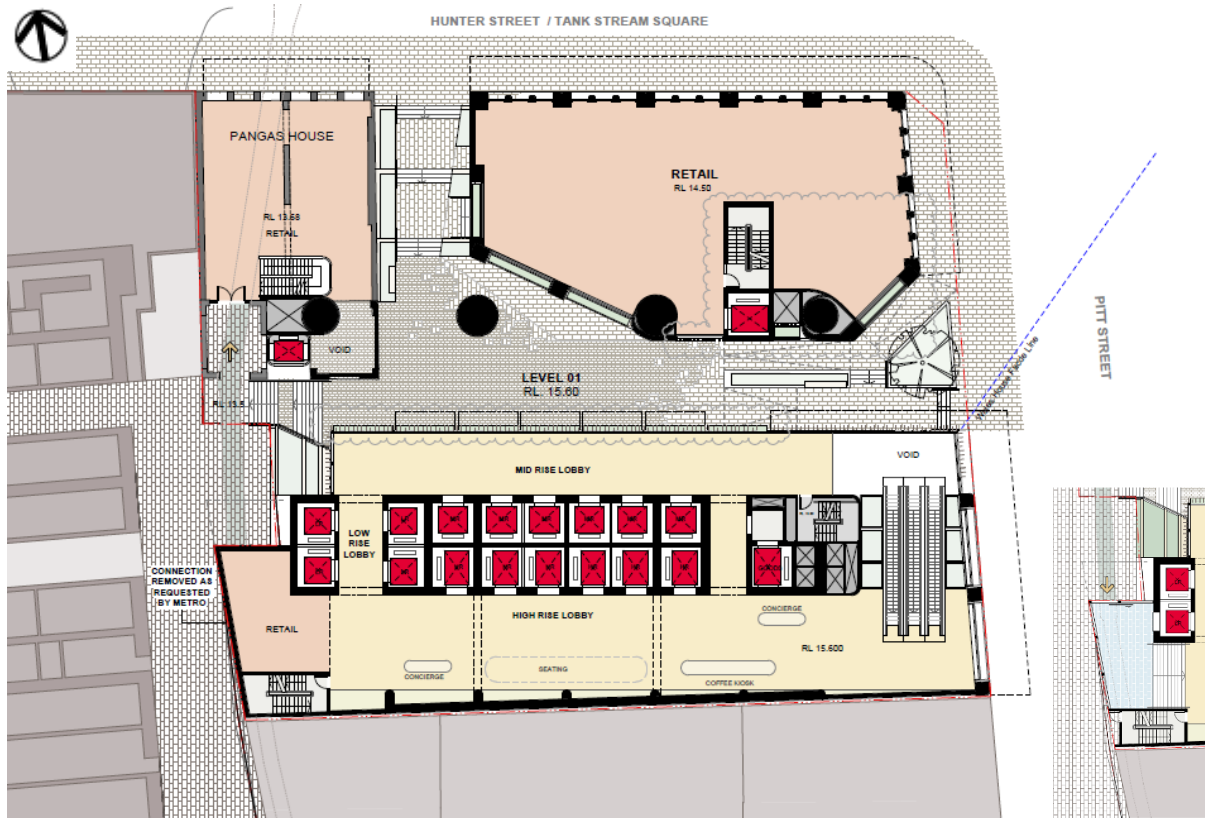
Proposed level 1 (Image insert: alternative building entry subject to design of Metro site)
